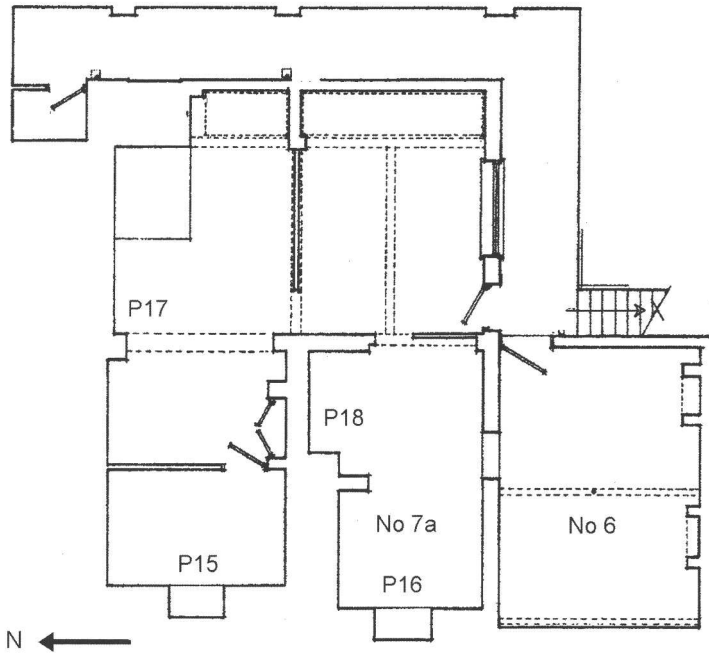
7a Abbey Lane. Plan of lower ground floor. Note the thick wall between the north and south rooms on the west side. Plate (x) refers to the photographs below. Note: the third room on the south side is the cellar of 6 Abbey Lane.
